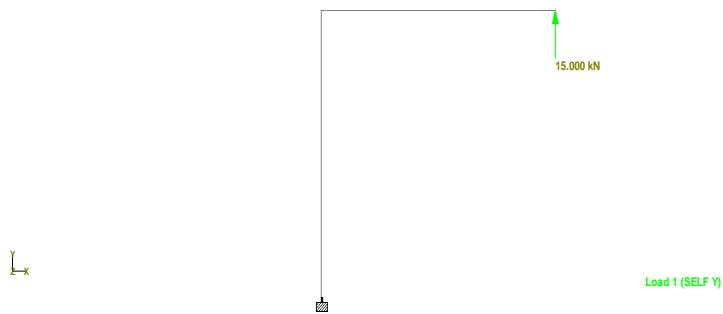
Beam column joint –for specimen-A as per Staad (Open joints)
